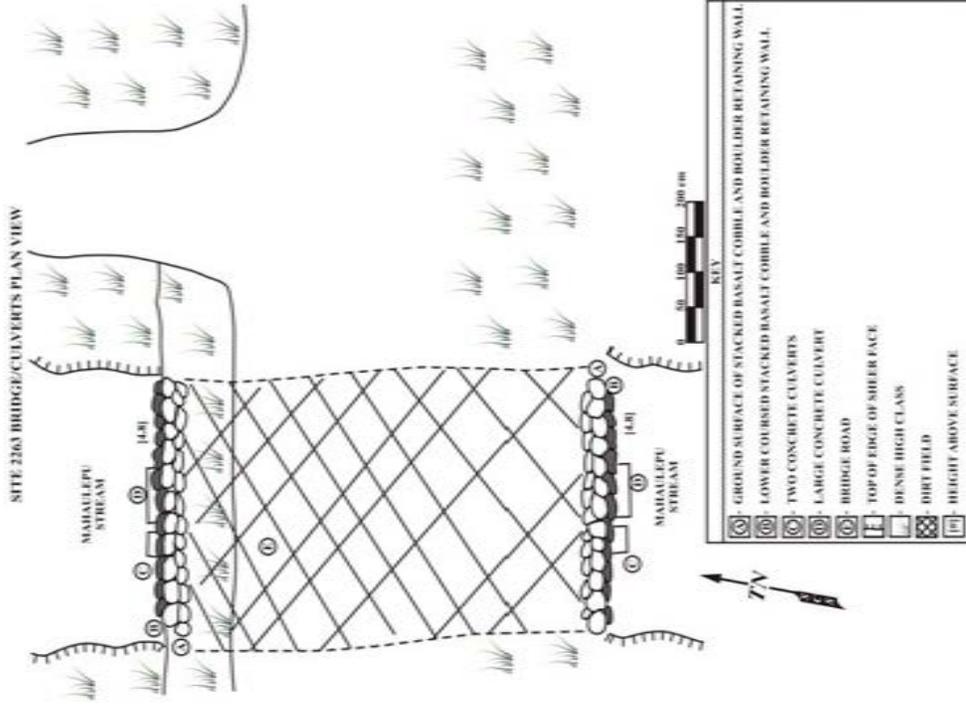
Planview of Site -2263. Retaining Walls and Culverts.
